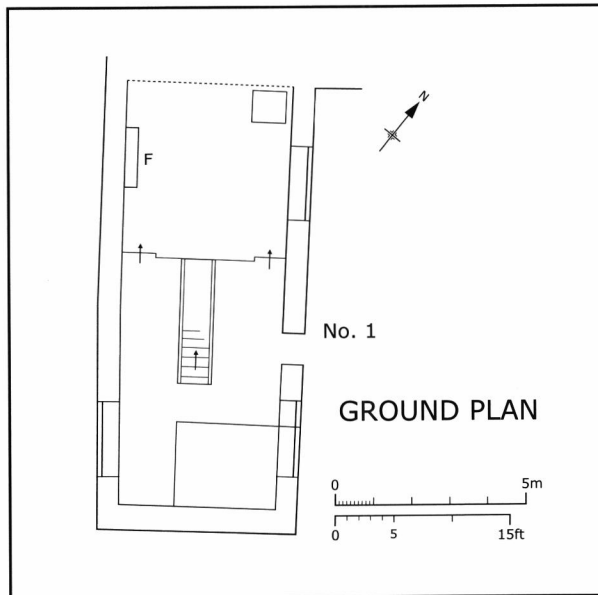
The Old Hall, Scarcliffe Lanes: sketch-plan of the ground floor of no. 1, c.1964
